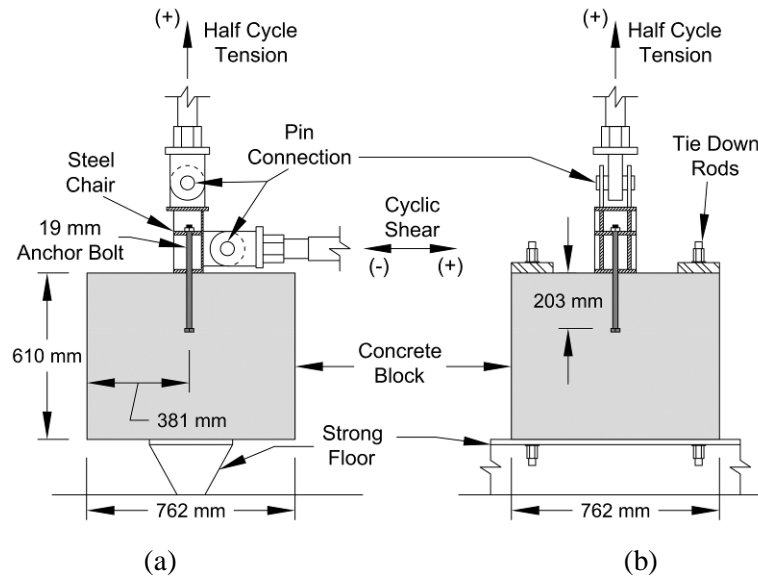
Single Anchor Test Setup: (a) Side Elevation; (b) Front Elevation
